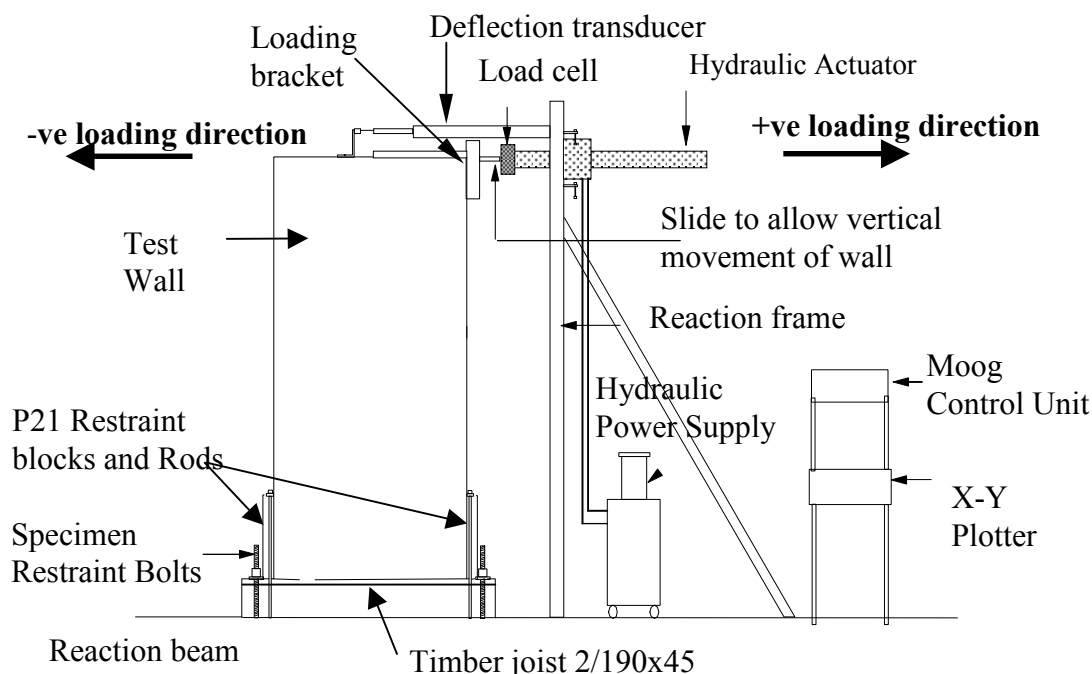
Timber Engineering P21 Wall Racking Test Setup
